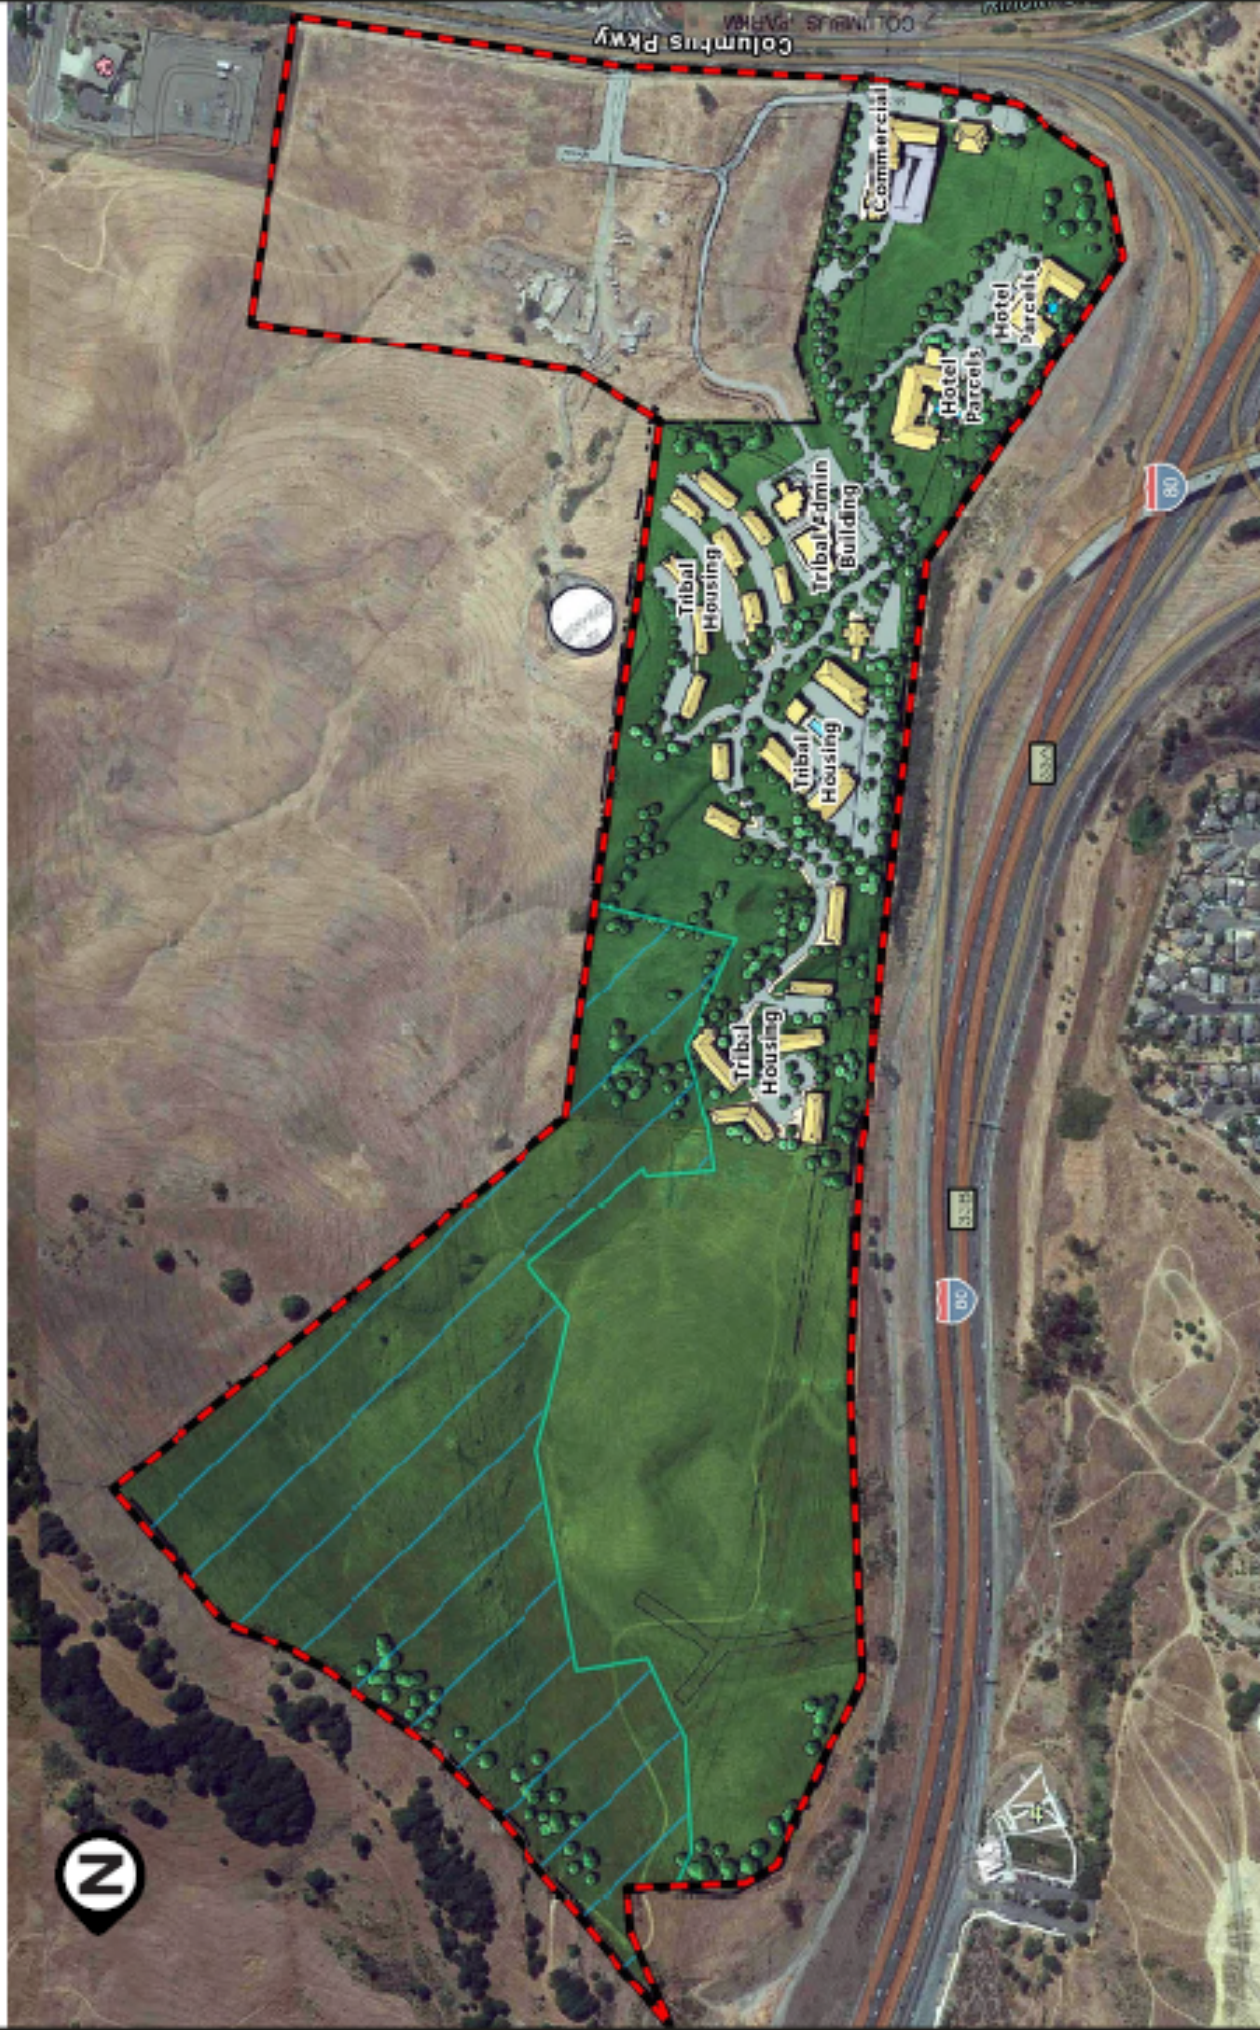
| ALTERNATIVE C NON GAMING ALTERNATIVE SITE PLAN
